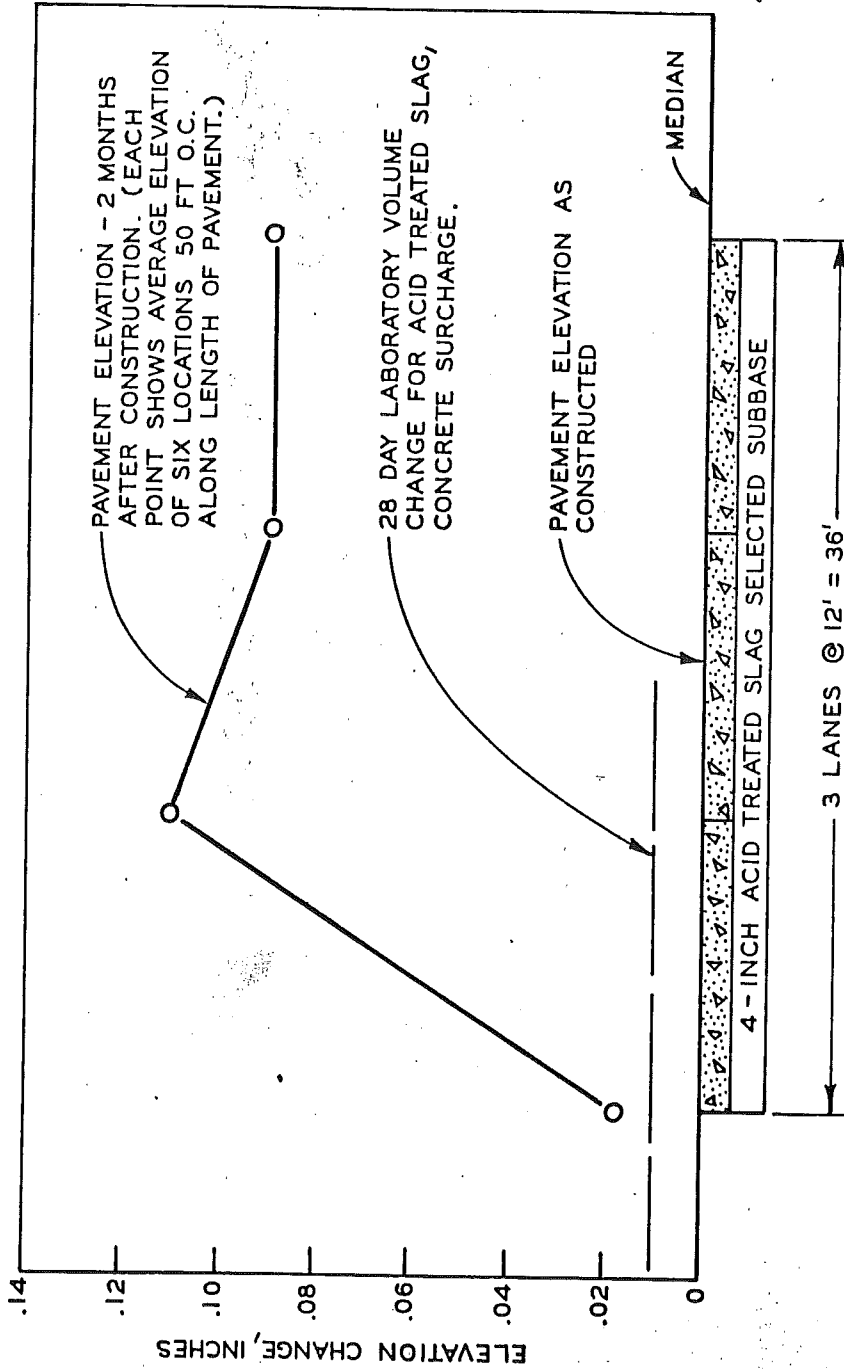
Change in elevations of concrete pavement placed over 4-in. slag selected subbase - two months after construction.
